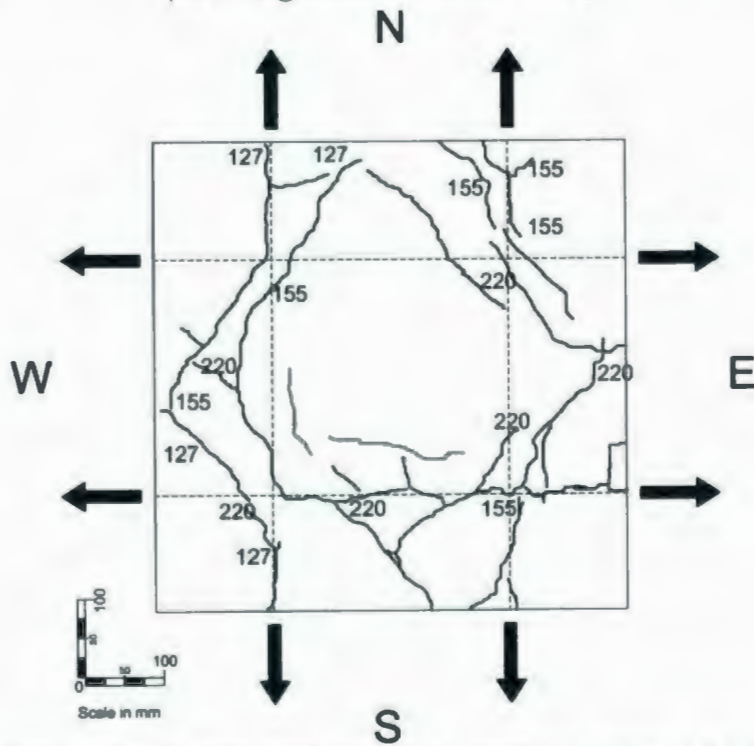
Stabilized crack pattern of panel P10-GNB-16-0.7-2.5
